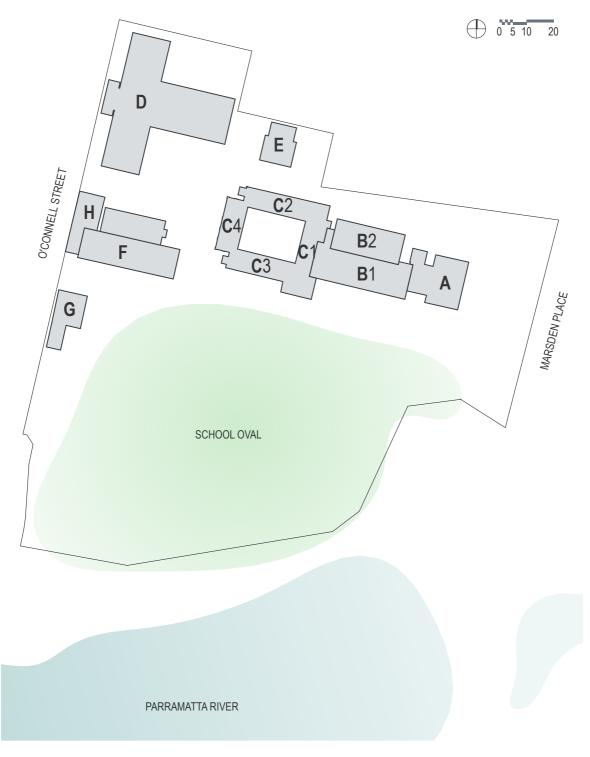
Building Identification Plan. Source: Tonkin Zulaikha Greer Architects, 2015
